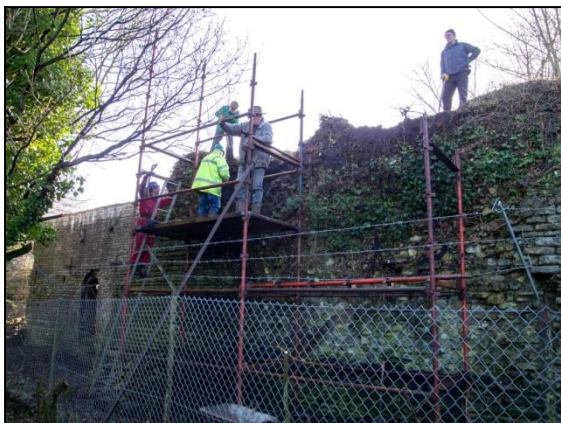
Erecting scaffolding along the north-west wall of the New Pit heapstead.
